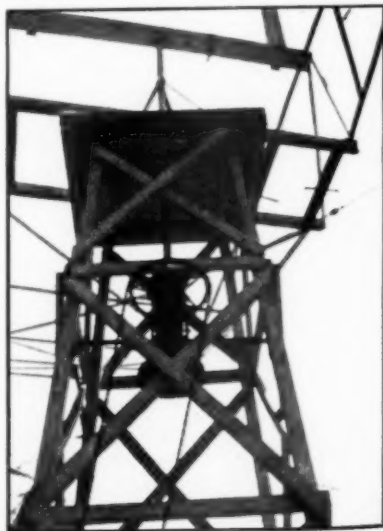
MOUNTING FOR THE DRIVE SHAFT AND GEARS
